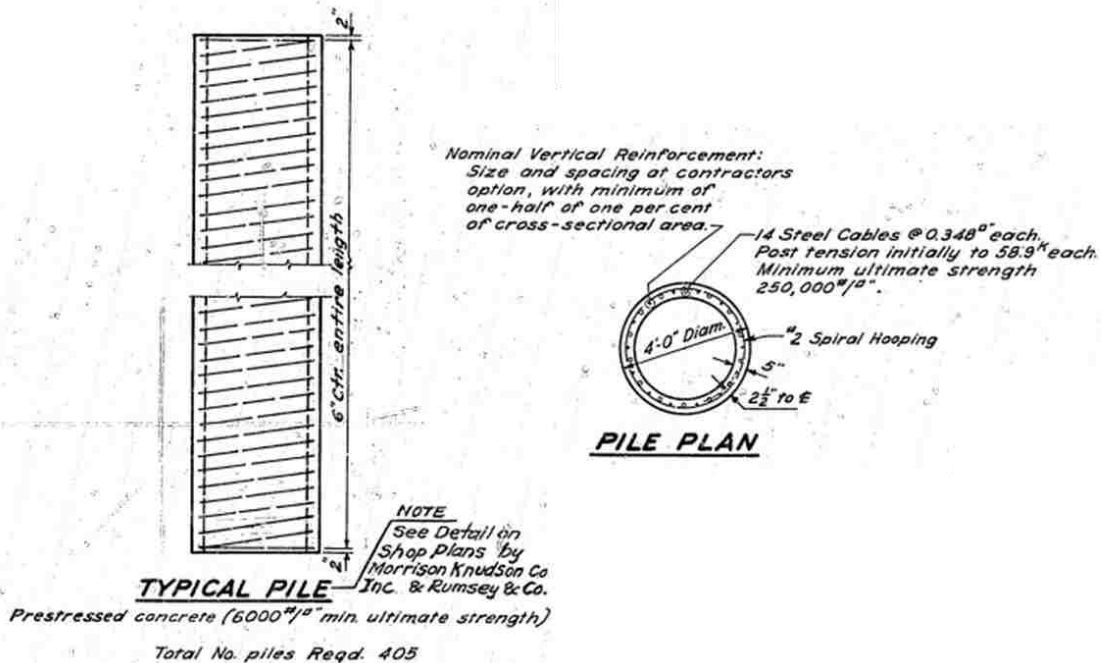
Details of hollow prestressed concrete pile-column (Galer-Lakeview)
